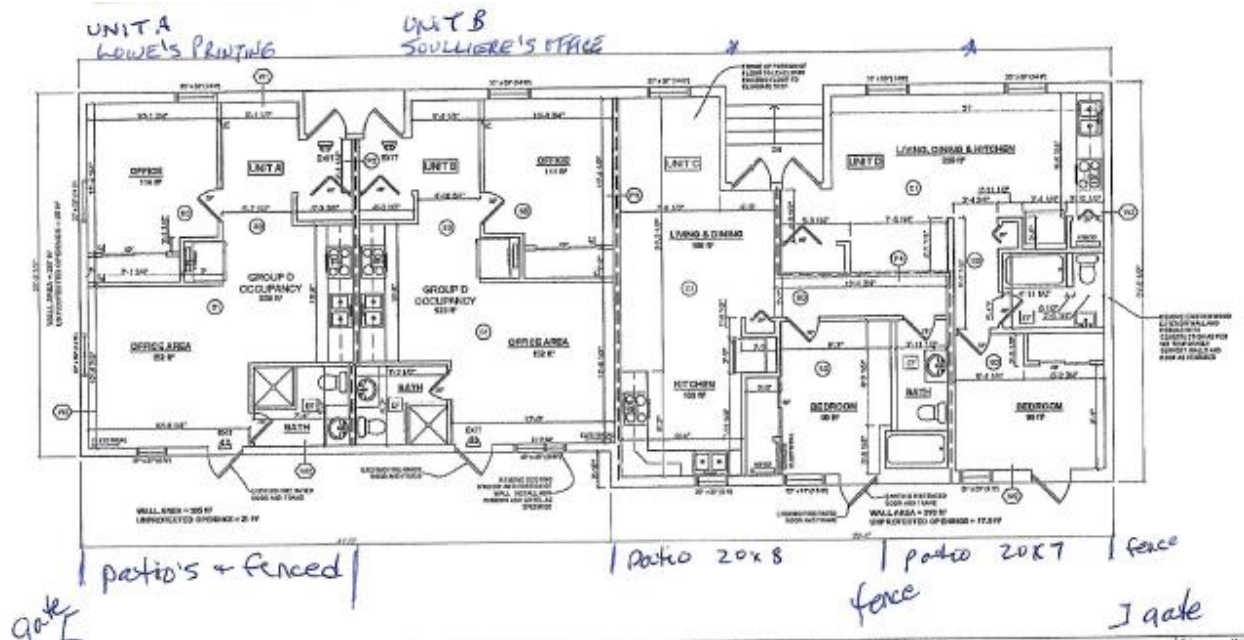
Proposed Interior Layout – Units A, B, C, and D
